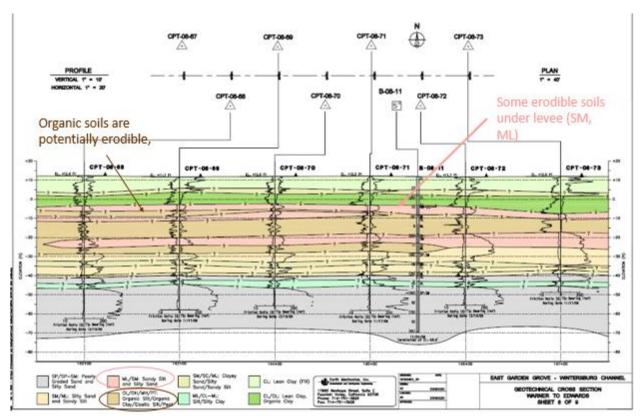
Geotechnical cross section developed by Earth Mechanics for Reach 1, to the east of Warner Avenue.
